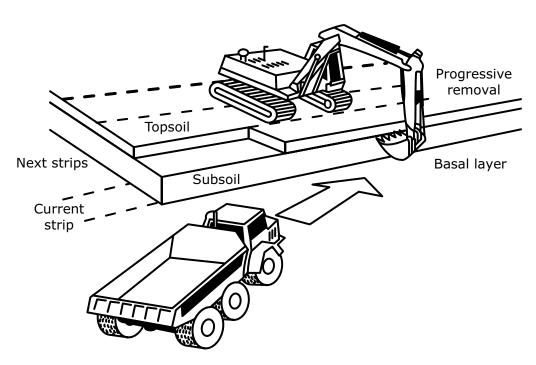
Stripping with excavators and dump trucks: removal of topsoil from a strip.
